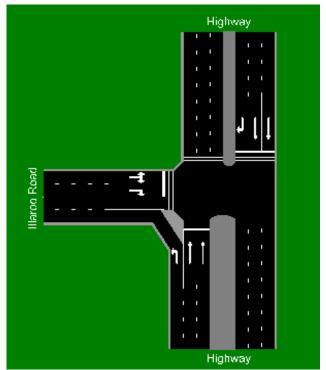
Existing Princes Highway / Illaroo Road Intersection Arrangement
